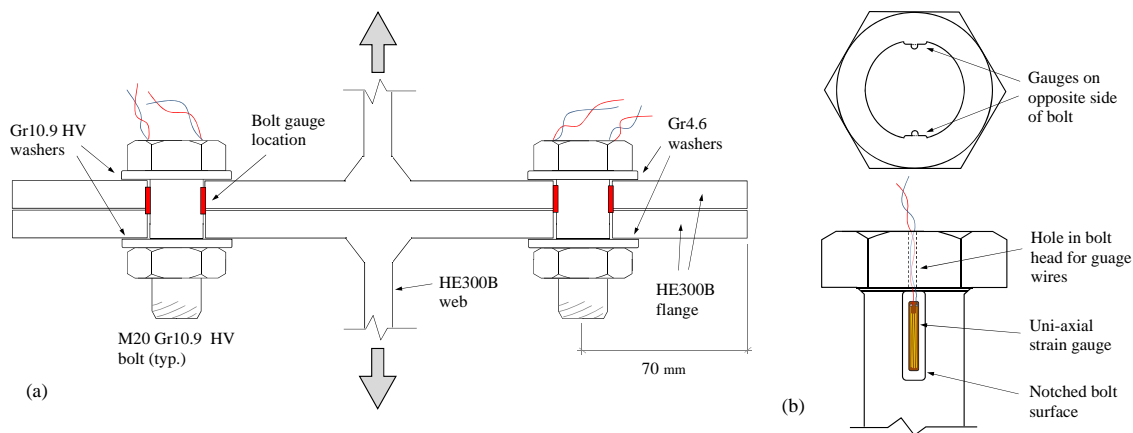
(a) T-stub specimen geometry and bolt locations (b) bolt instrumentation.
